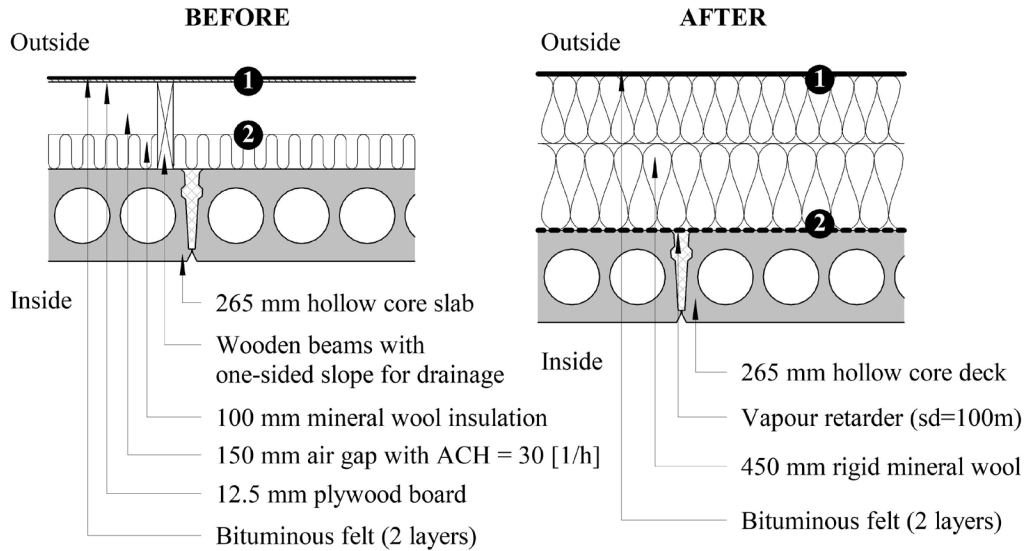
Cross-section view, roof construction, initial and retrofitted state.
